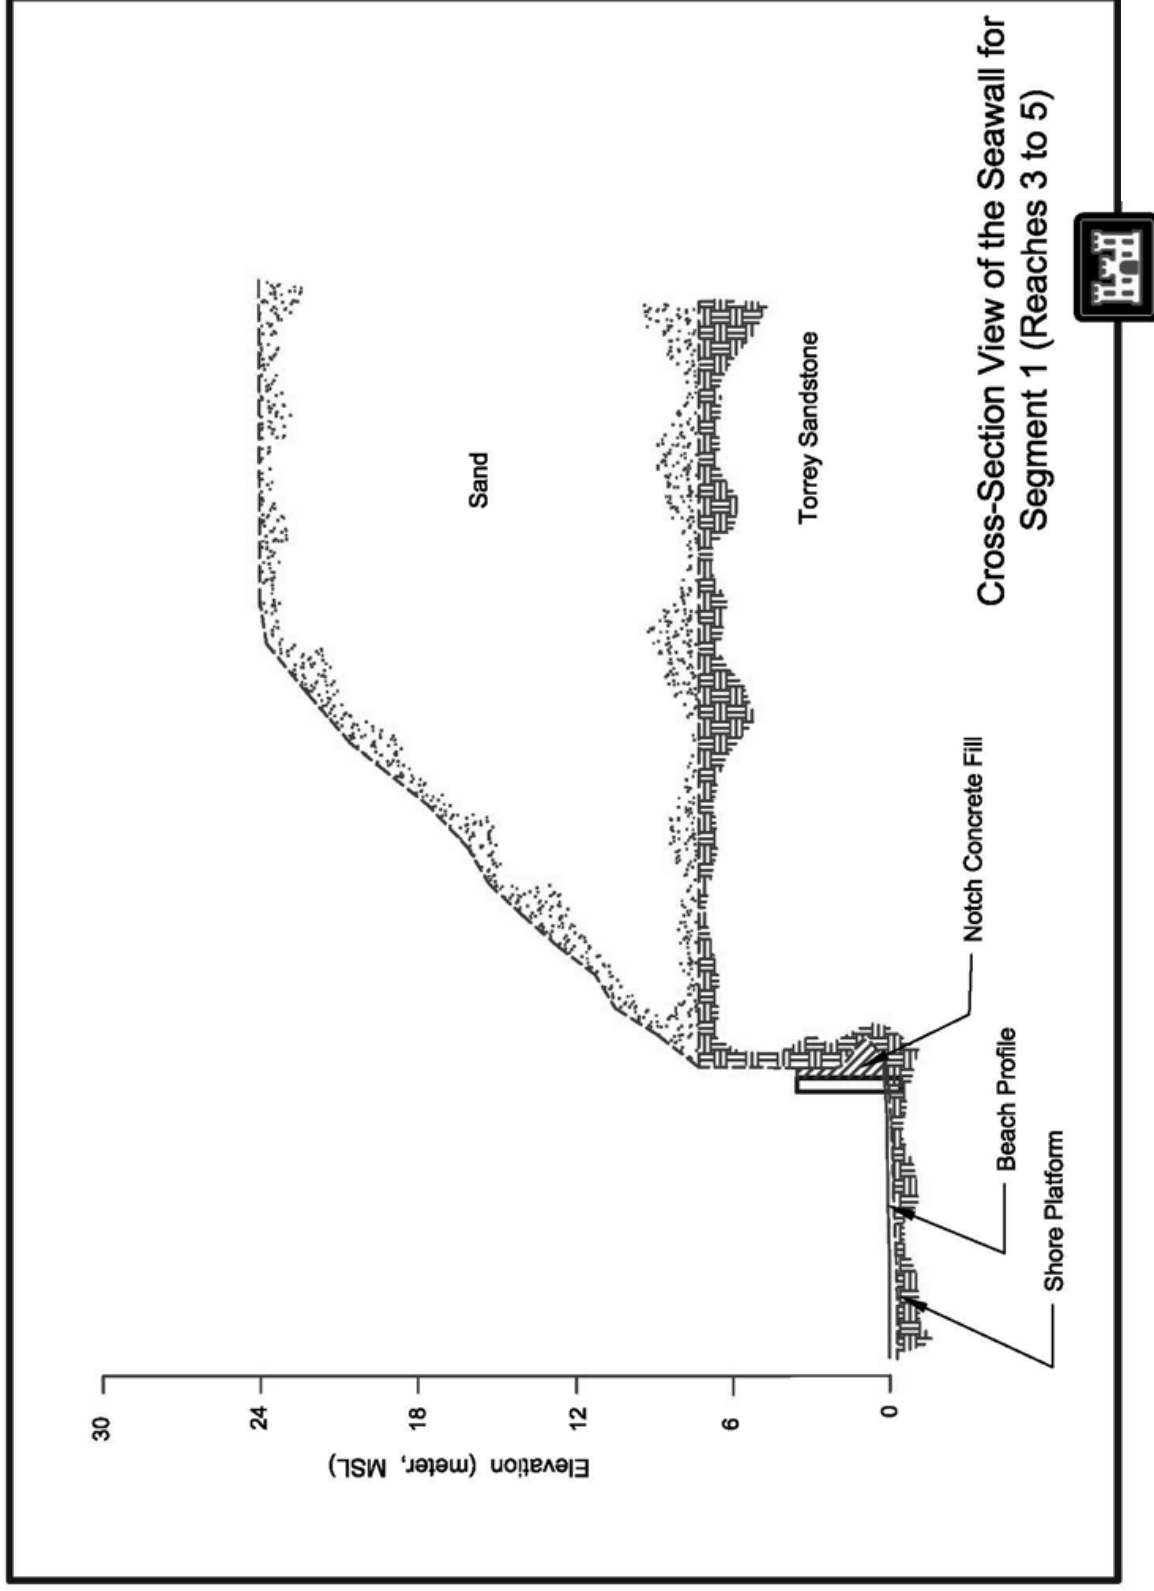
Cross-Section View of the Seawall for Segment 1 (Reaches 3 to 5)
